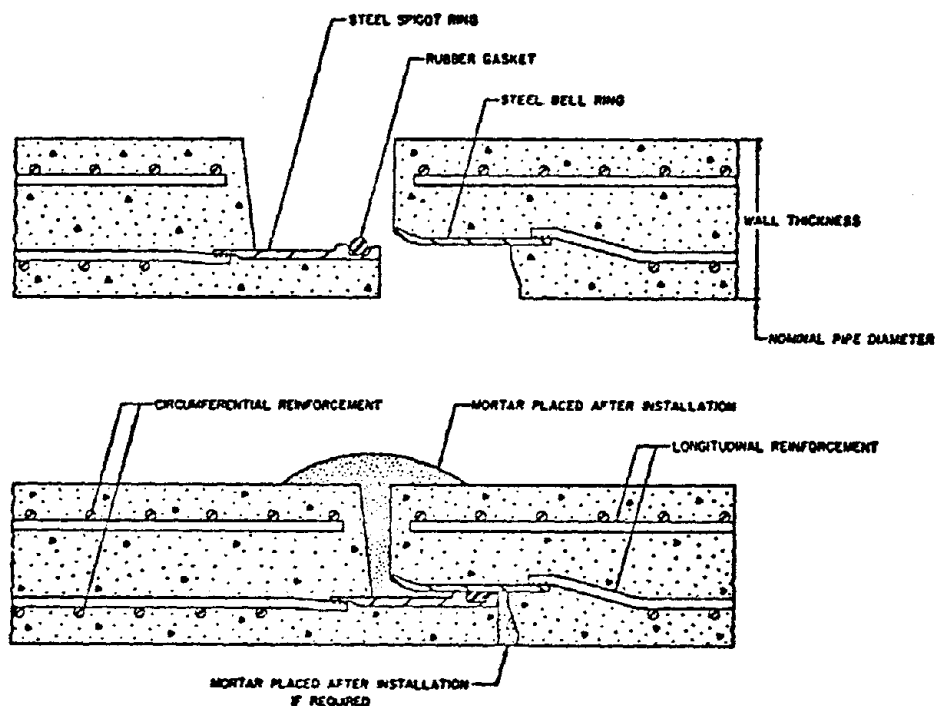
Noncylinder Nonprestressed Concrete Pipe and Joint - RC
